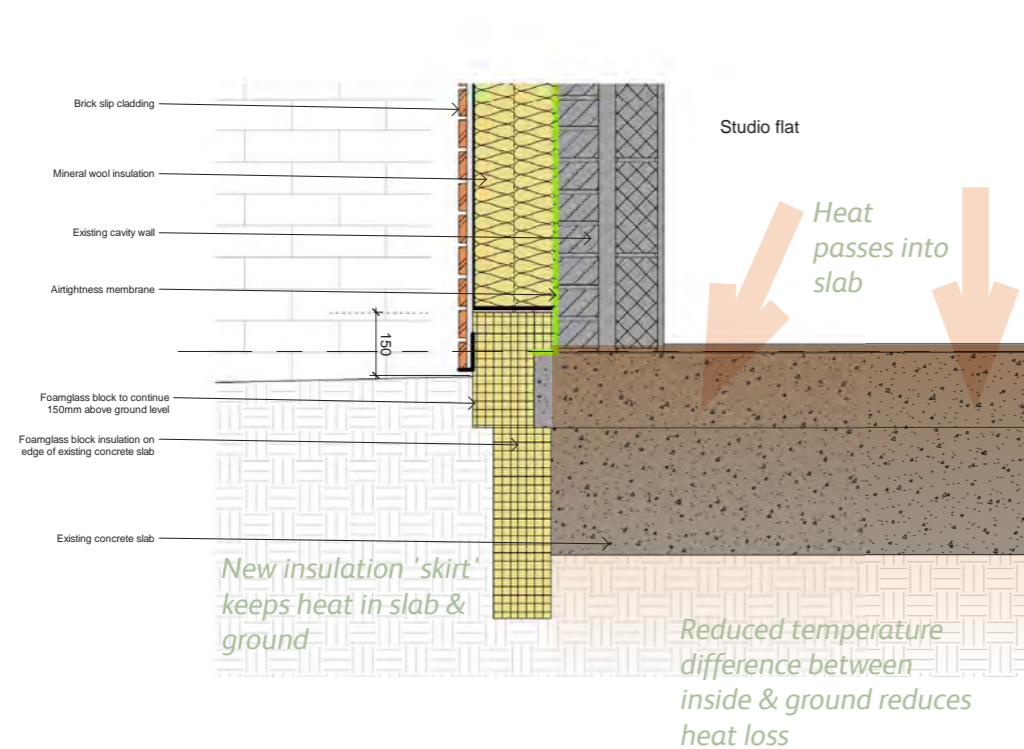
Insulation of Ground Floor Slab - South & West Facades
